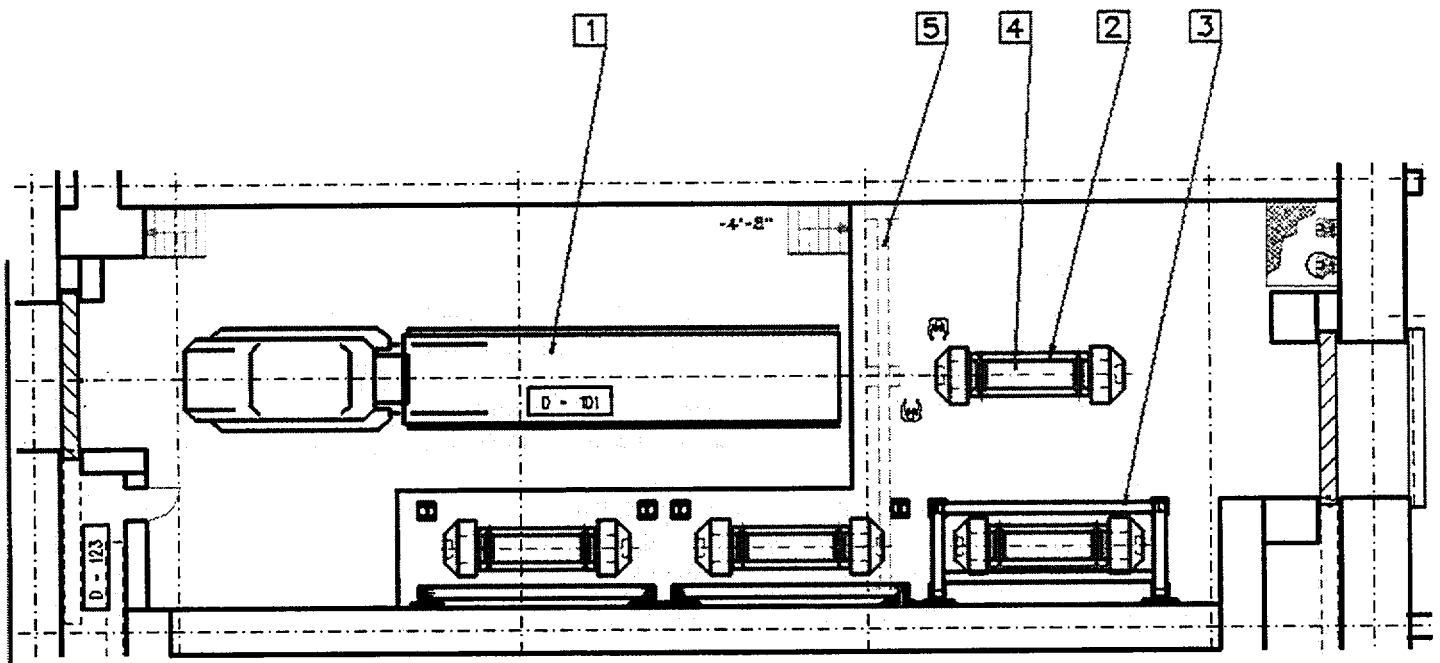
Assembly Handling and Storage Unit (continued)
